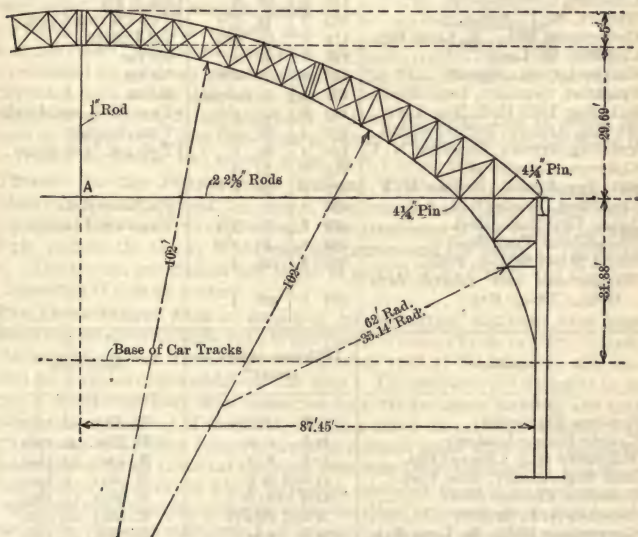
Arched Truss for Sullivan Square Station, Elevated Railway, Boston, Mass.
